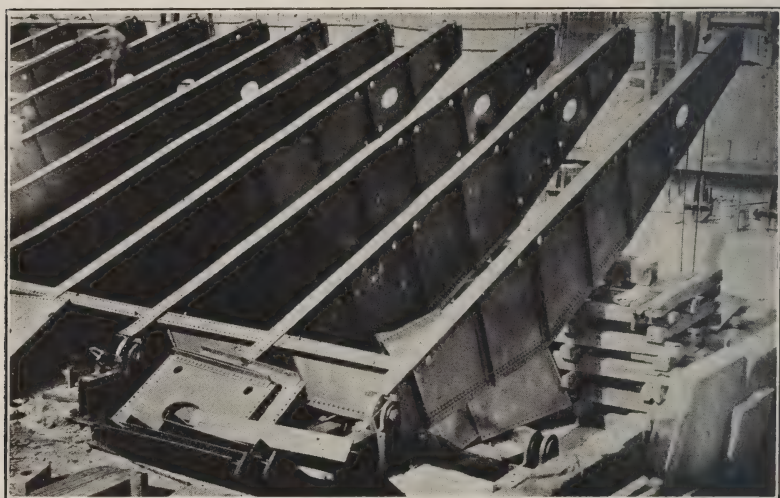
Standard lower leaf under construction, showing main girders in place.
